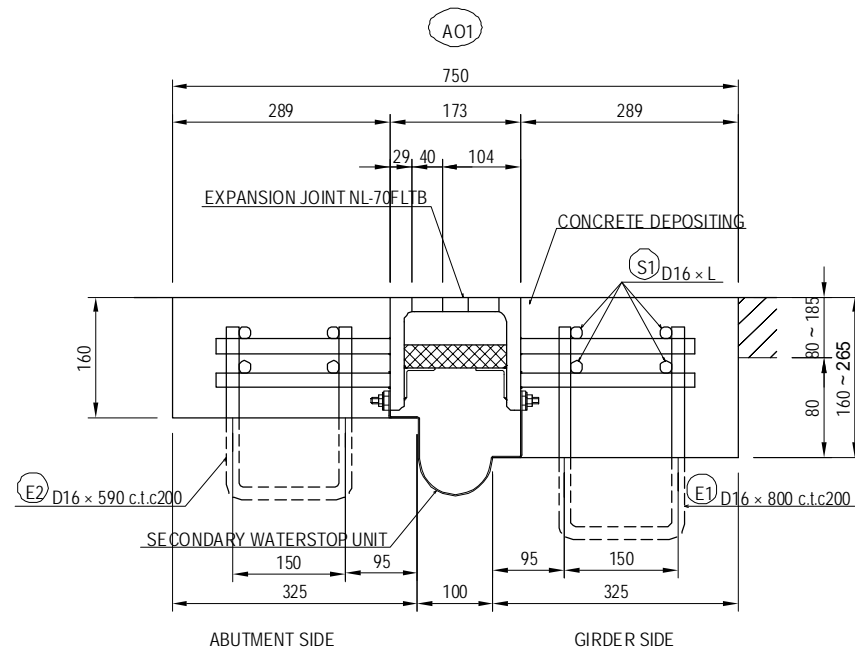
DETAIL OF EXPANSION JOINT FOR ON-RAMP AO1
